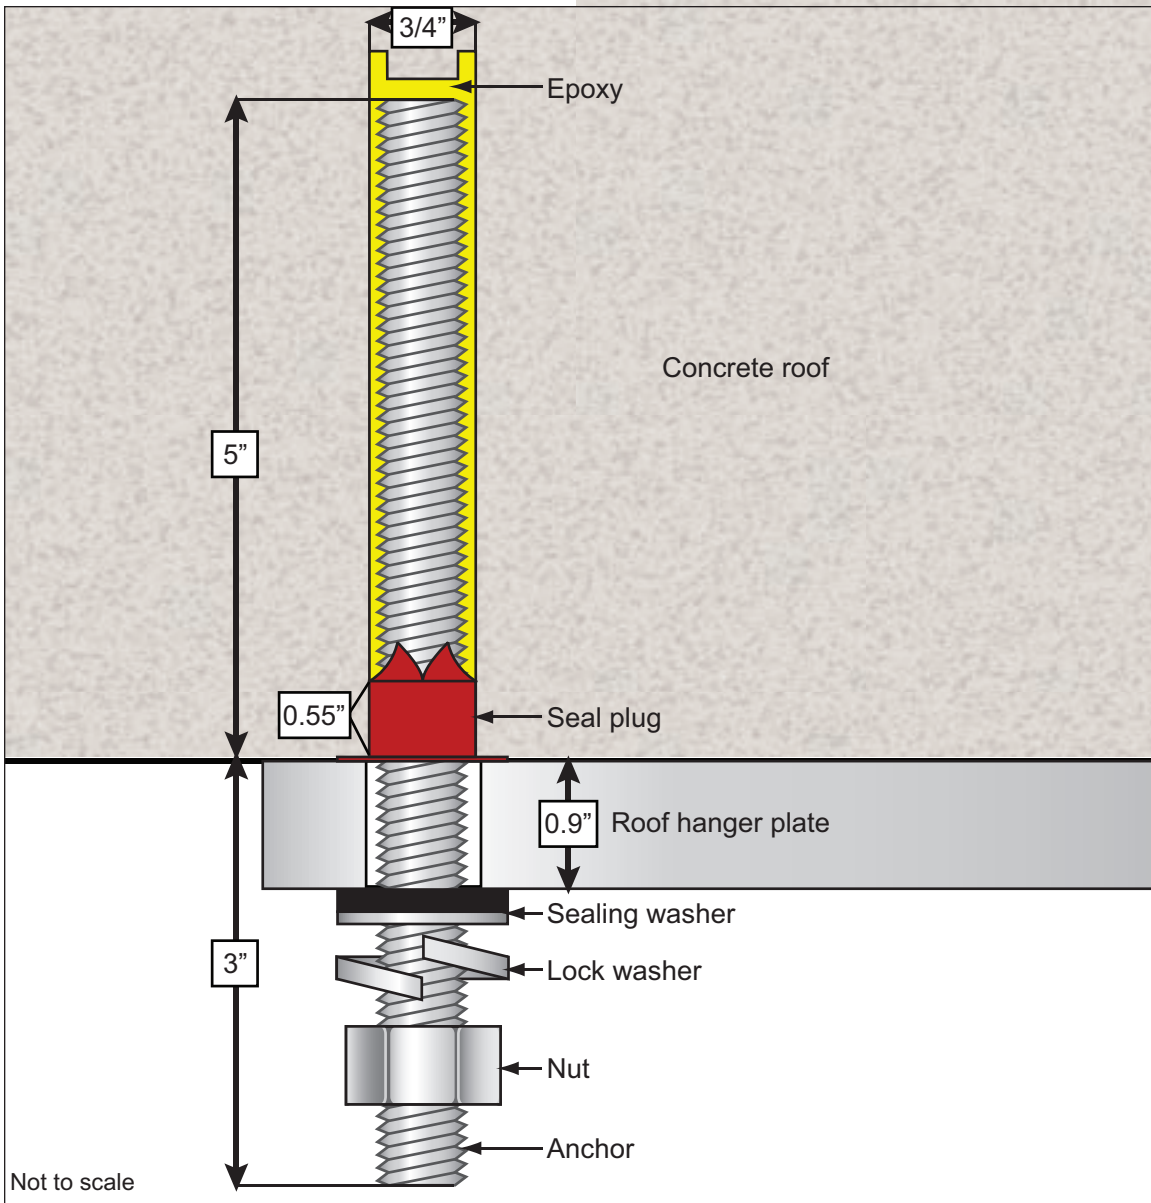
Typical adhesive anchor and roof hanger plate assembly.
